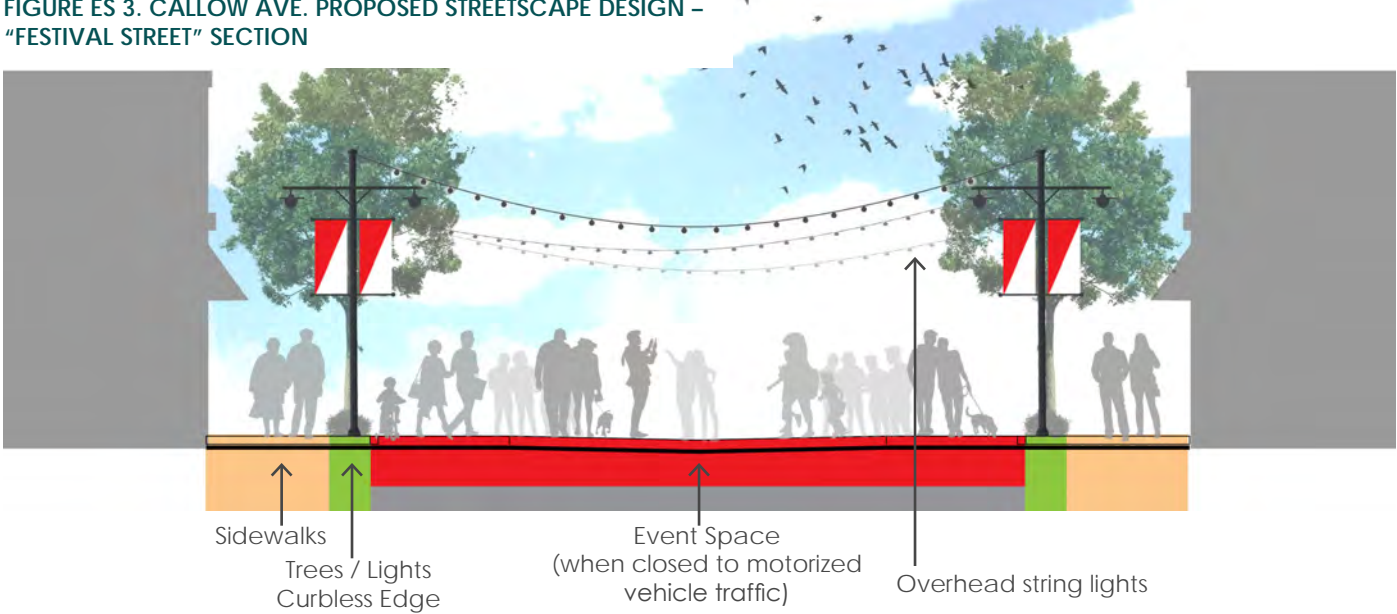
CALLOW AVE. PROPOSED STREETScape DESIGN – “FESTIVAL STREET” SECTION
